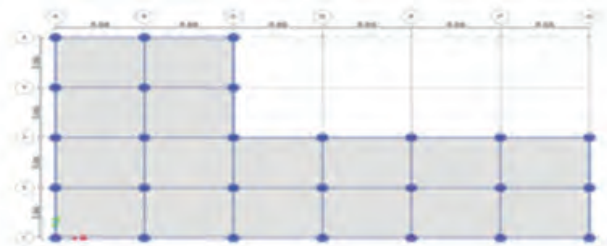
Structural Plan of G+15 L-Shaped Building with Circular columns
